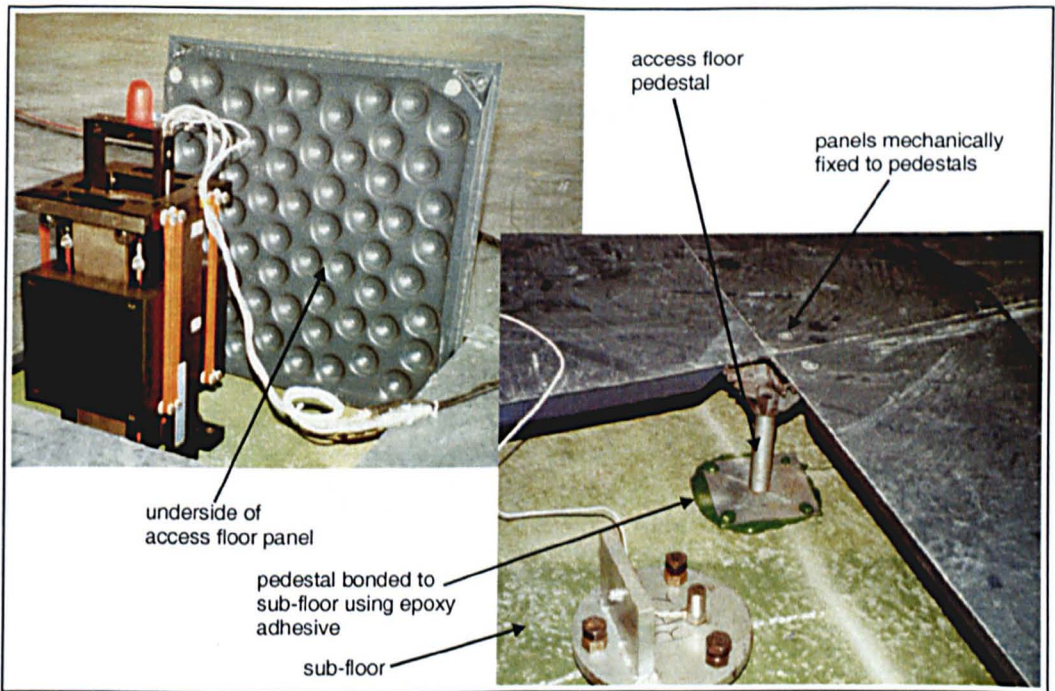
Structure A (Configuration 2) - General Construction of the Access Floor.
